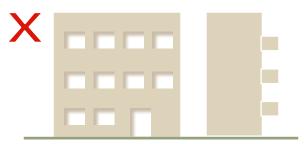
Large openings, arranged in grid patterns, projected balconies should be discouraged
